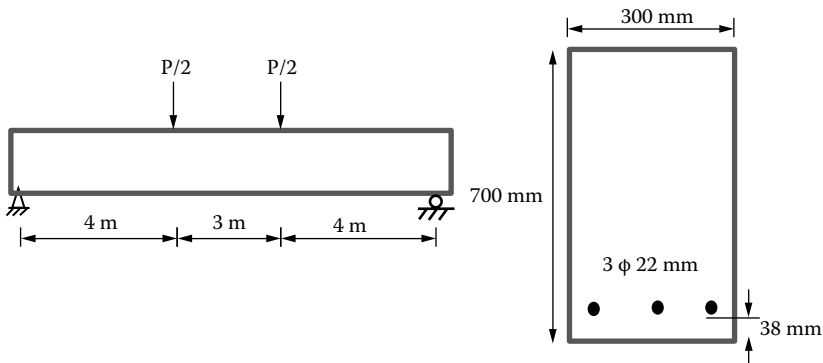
Beam profile and cross section for Example 2.7.
